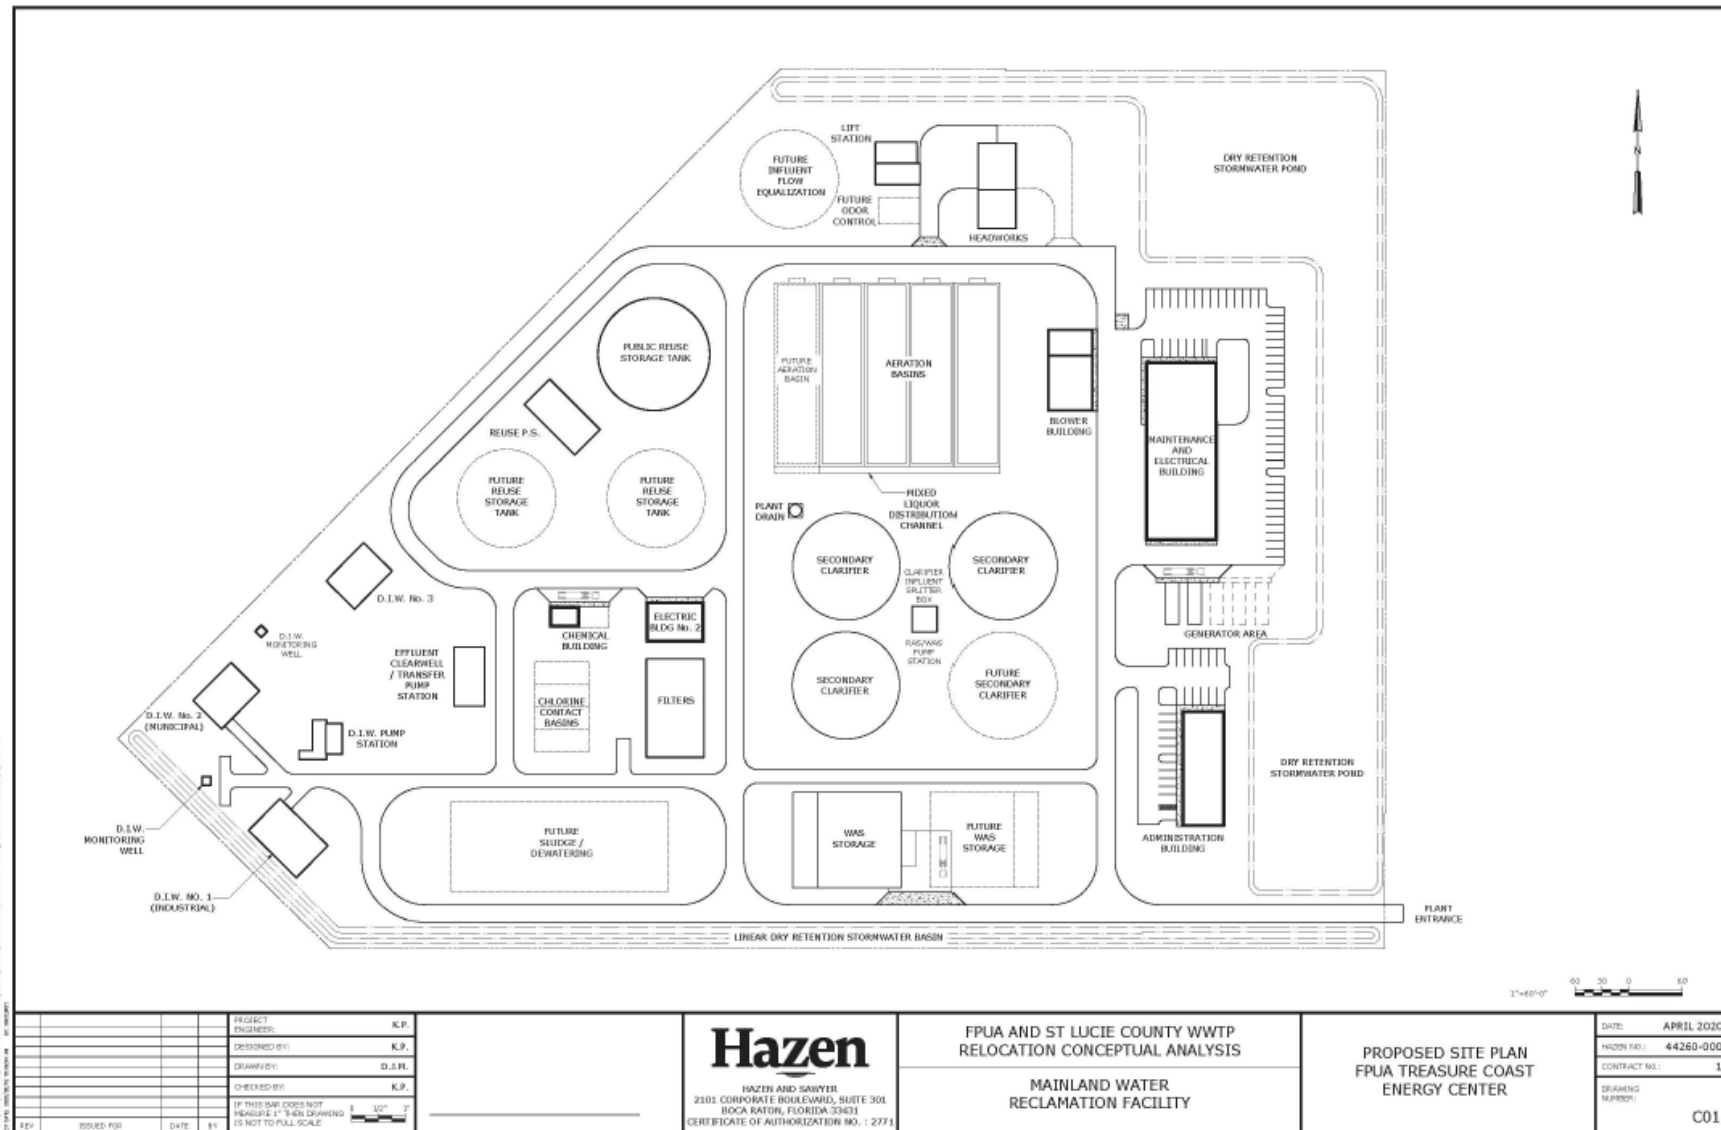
FPUA Treasure Coast Energy Center Proposed Site Plan
